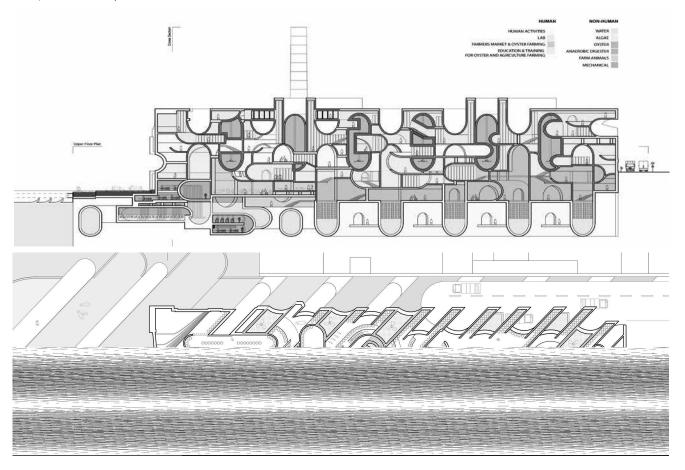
Plan and section, Cows and Oysters, Sohhee Oh
